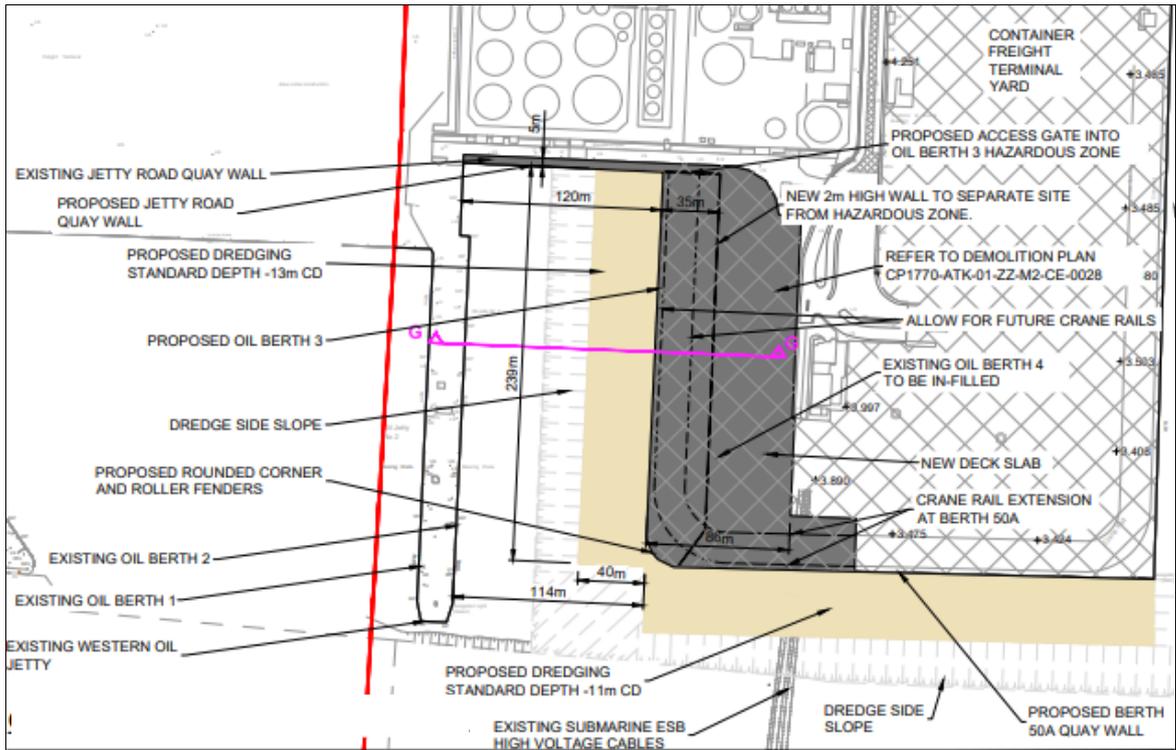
Plan View of Proposed Extension to Berth 50A, Redesigned Oil Berth 03 and Infilling of Oil Berth 04 Basin
